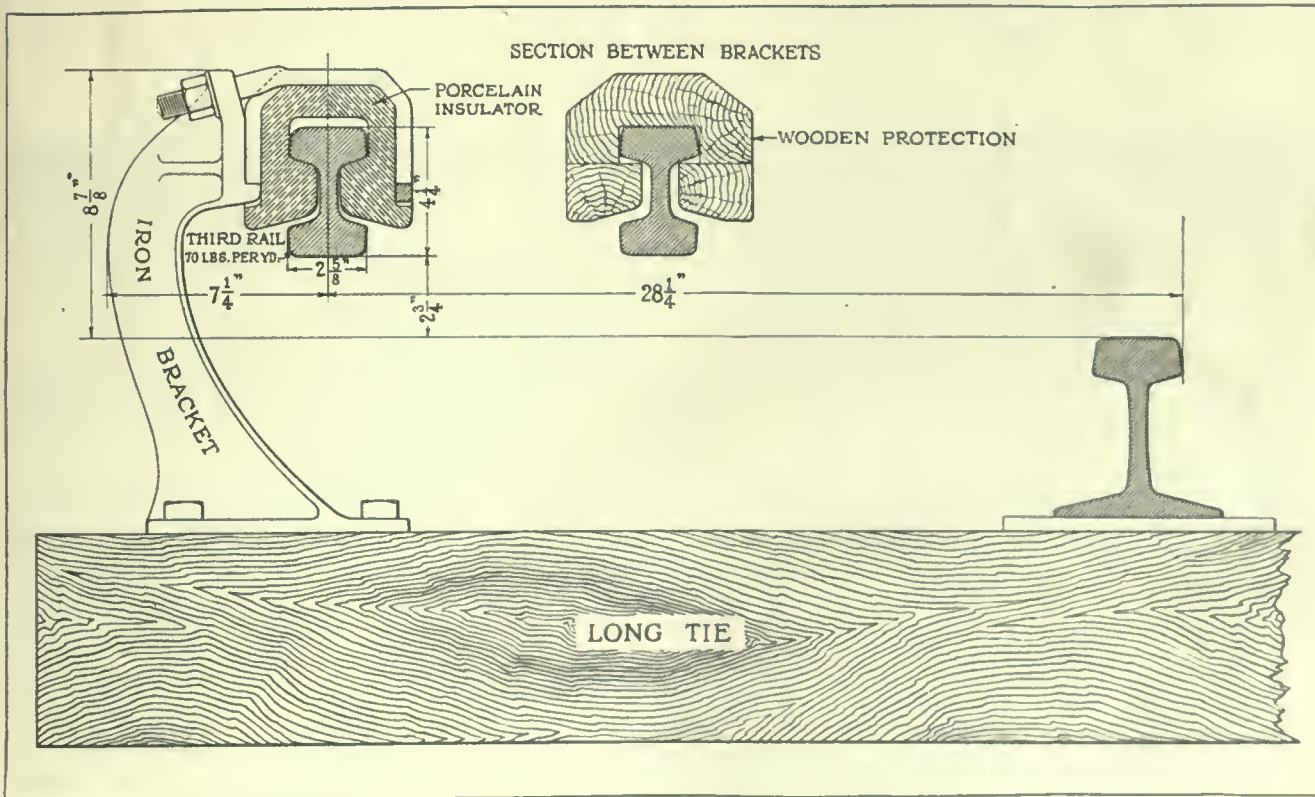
UNDER RUNNING THIRD RAIL INSTALLATION. POSITION OF THIRD RAIL WITH REFERENCE TO TRACK RAIL, THIRD RAIL SECTION, SUPPORTING BRACKET AND INSULATOR
